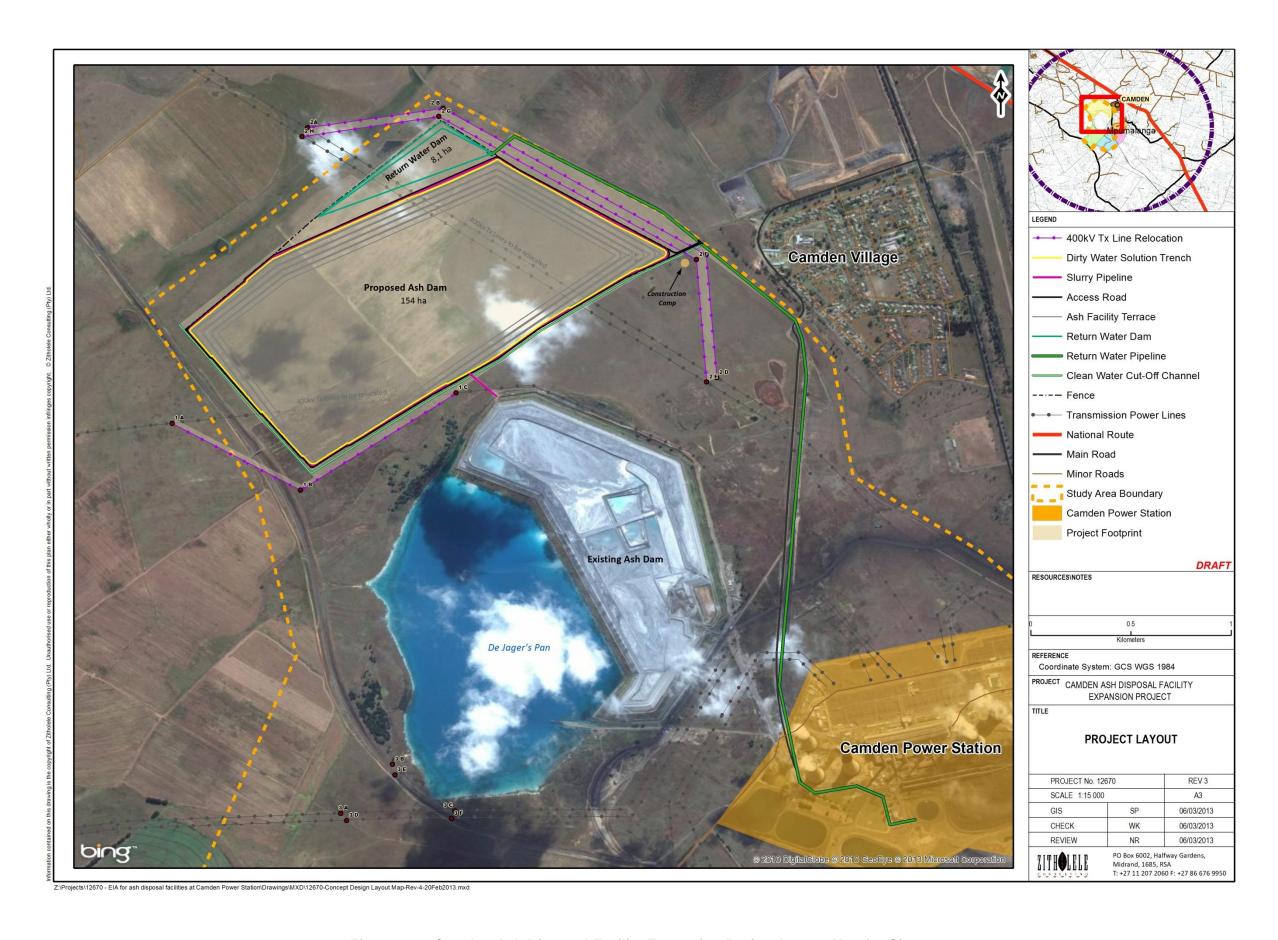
Camden Ash Disposal Facility Expansion Project Layout Map for Site 1
